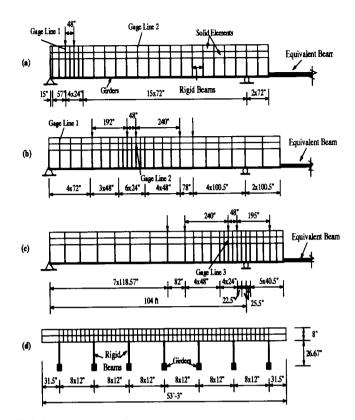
Finite-element meshes: (a) Longitudinal section for Load Group 1; (b) longitudinal section for Load Group 2; (c) longitudinal section for Load Group 3; (d) transverse section for all three load groups (1 in. = 25.4 mm).
